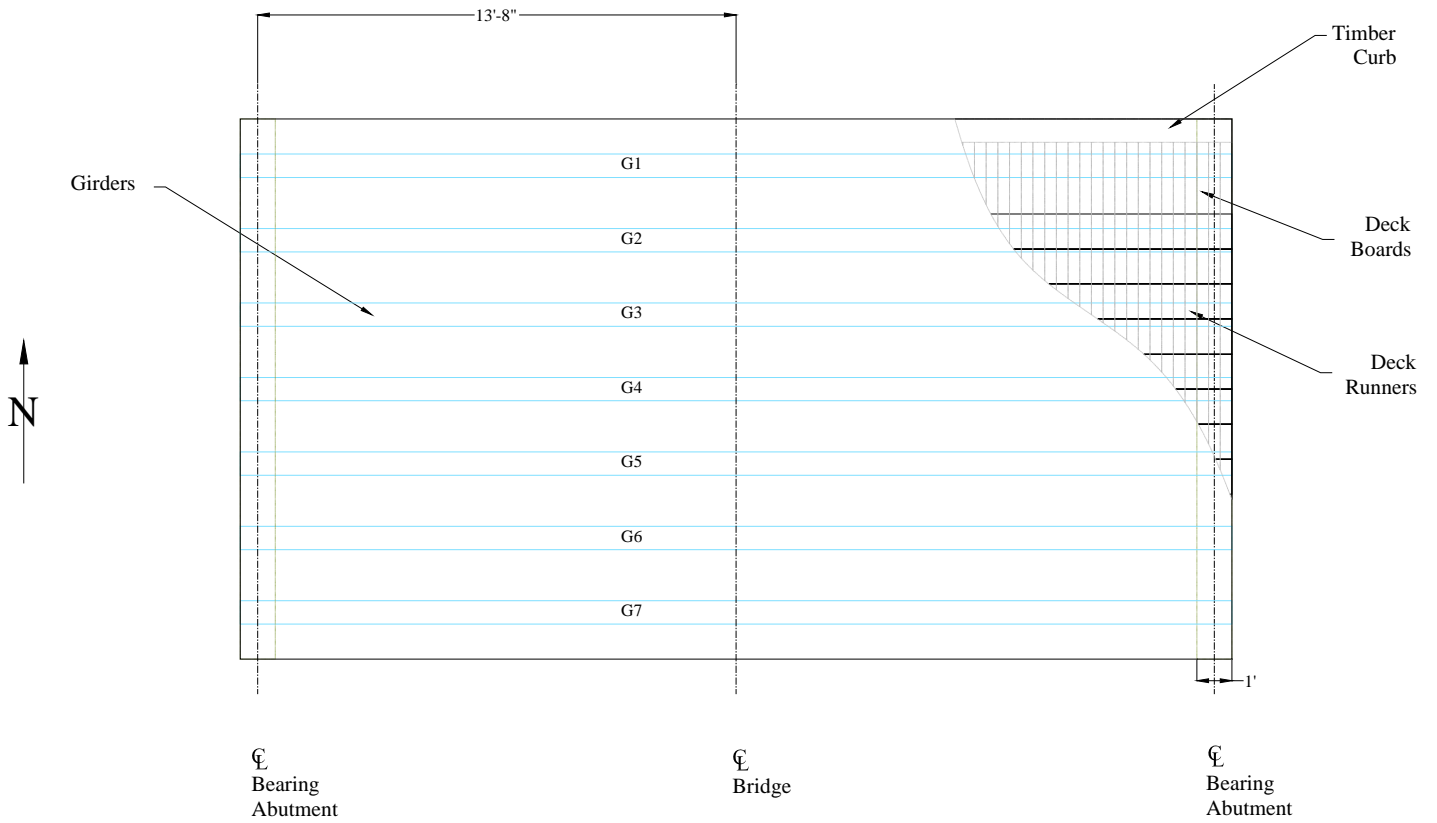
Plan and Profile Layout of Burnt Fork Bridge
